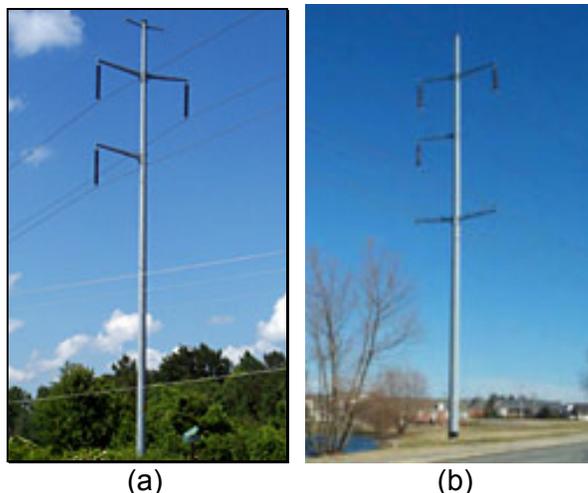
Single-Pole (a) and Single-Pole With Underbuild (b) 161-kV Transmission Structures
